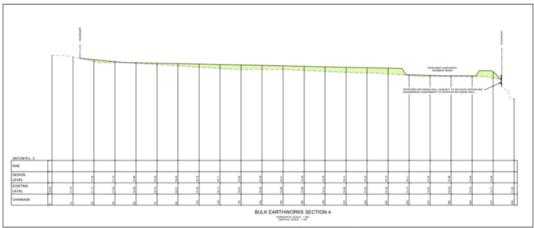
Site Section 4 (See Figure 5)Source: Craig & Rhodes
